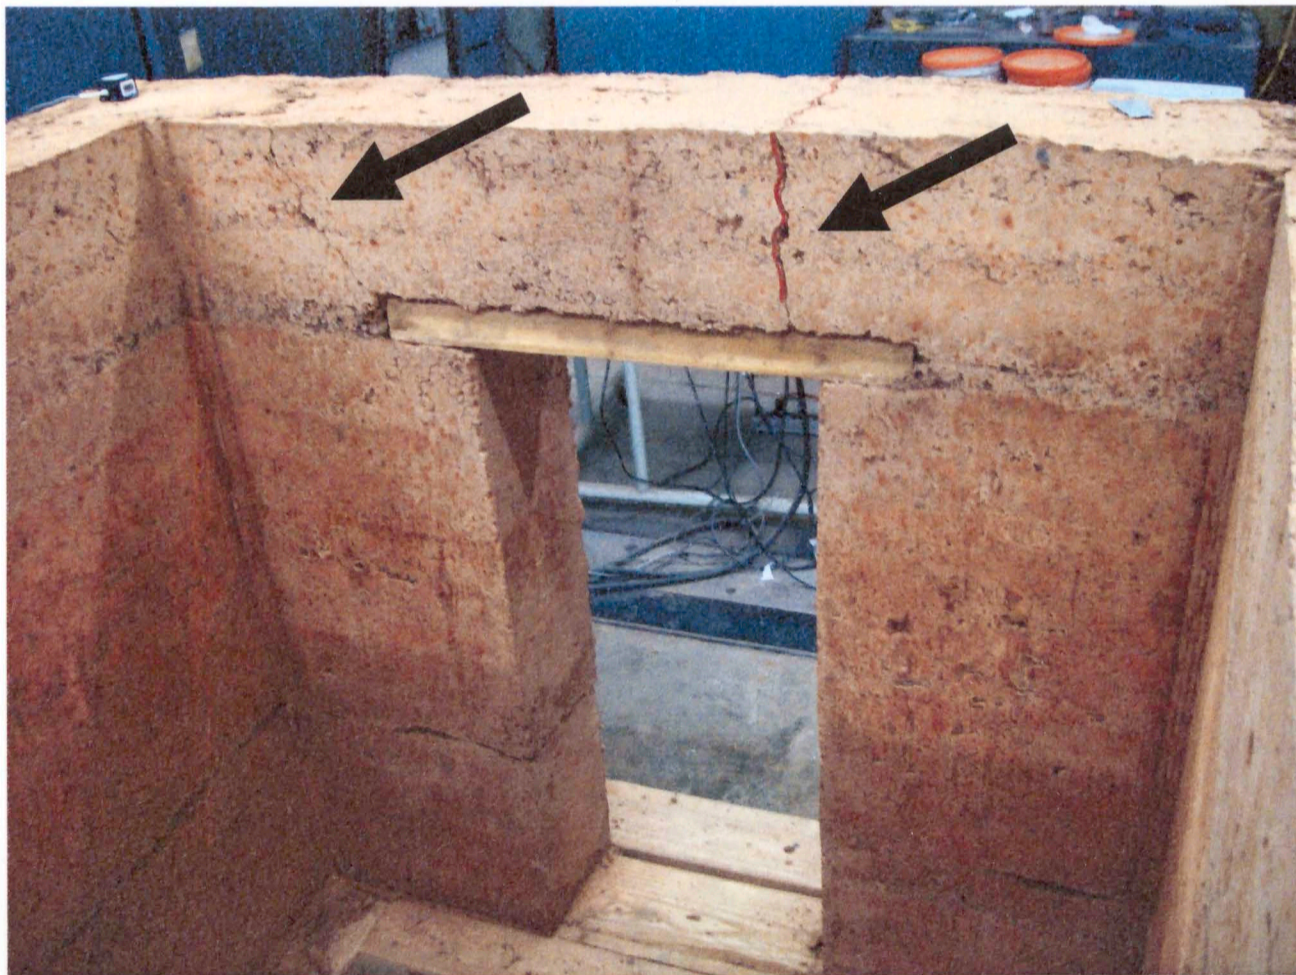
Test 2 Interior view of east wall with cracks above lintel and delamination
